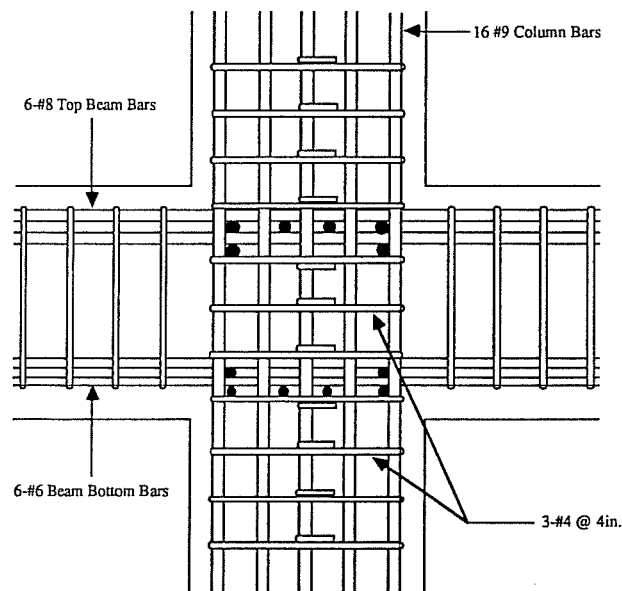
Typical "Rigid" Reinforced Concrete Beam to Column Connection [10]
